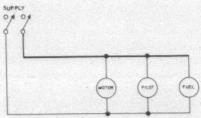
Electrical wiring system is used on standard type boilers with a motor driven fan for combustion air, a pump to provide oil pressure, a gas pilot ignition assembly, and an oil shut-off valve.
